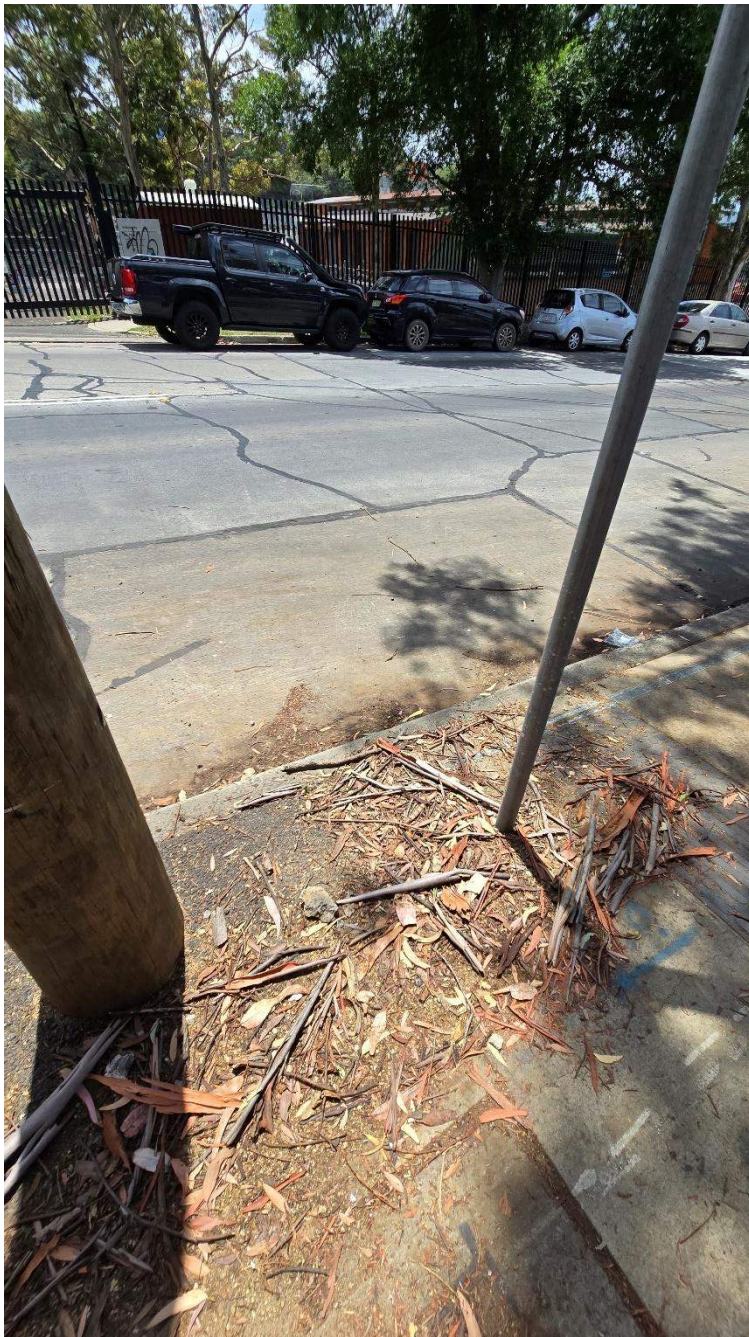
Cracks observed (37, 38, 39) - Road exhibits substantial joint sealant repairs, several cracks observed throughout road
